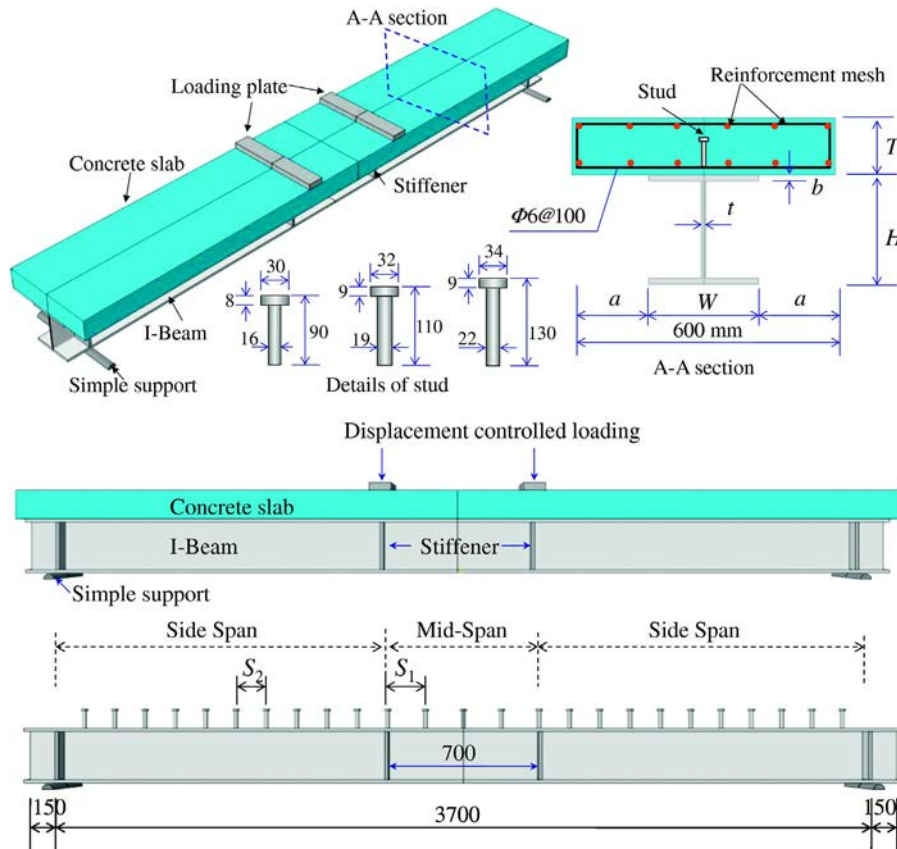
Details and test setup of steel-elastic concrete composite beams.
